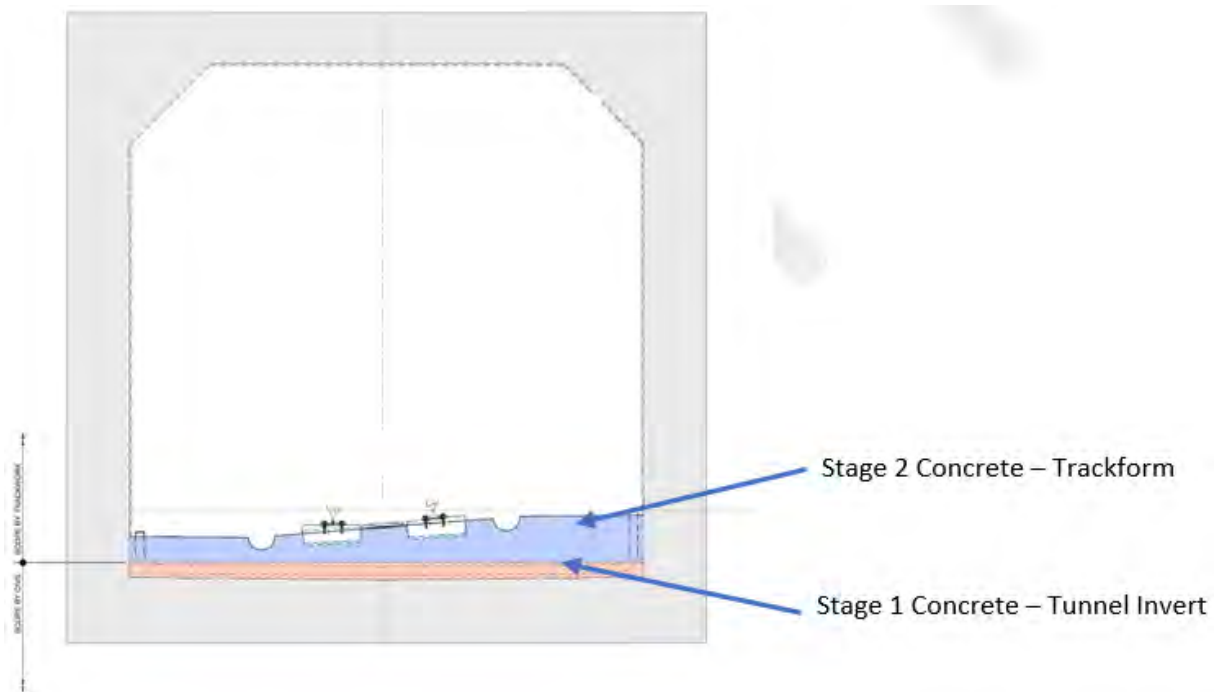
Stage 1 (Invert Concrete) and Stage 2 Concrete (Trackform) required for the Works
